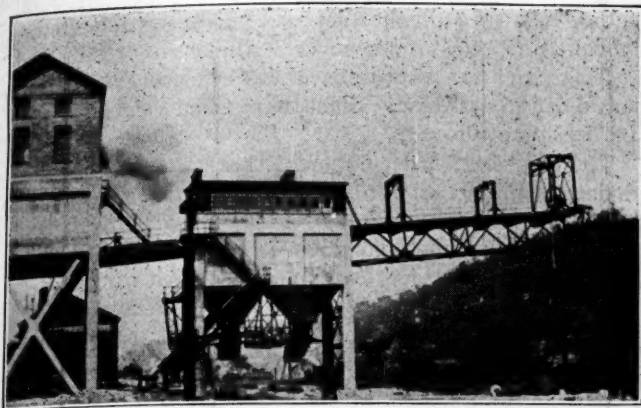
CONCRETE WALLED ENTRANCE TO THE SLOPE
